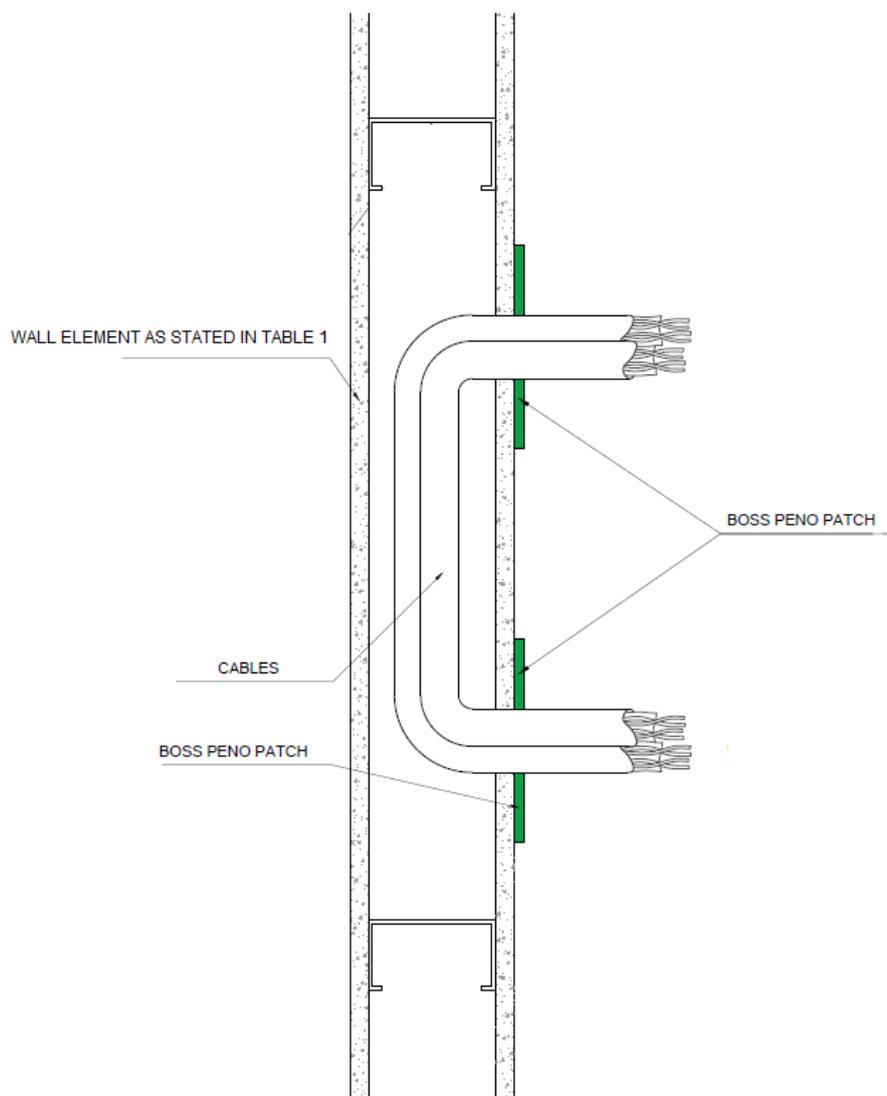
Cable penetrations penetrating the wall without exiting to the other side
